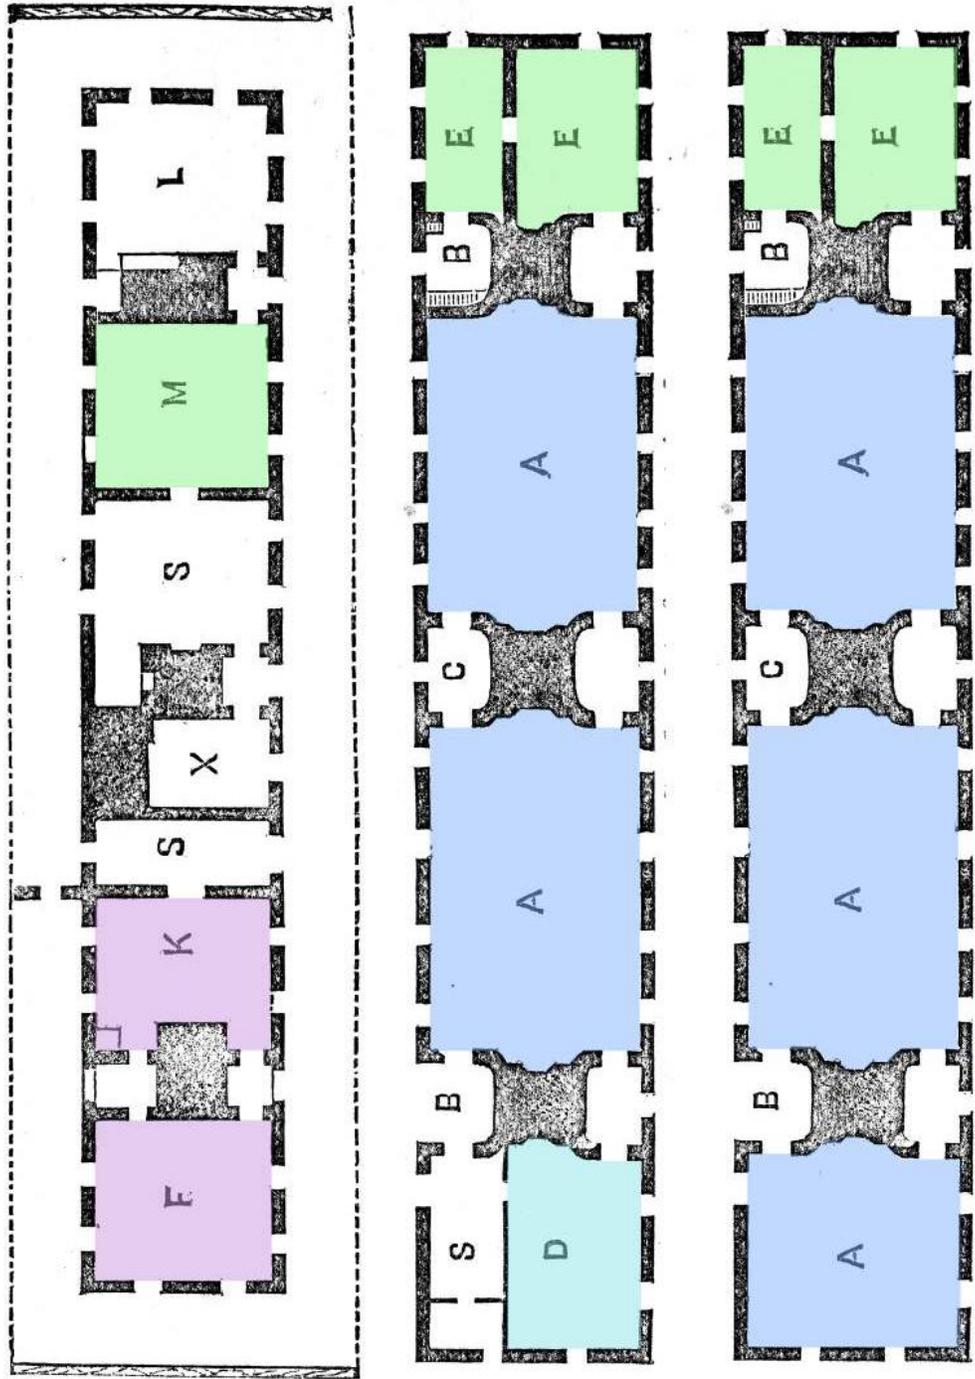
Jefferson Barracks, Missouri hospital floor plan [left basement, middle 1st floor, right 2nd floor] 1875 (Circular #8).
